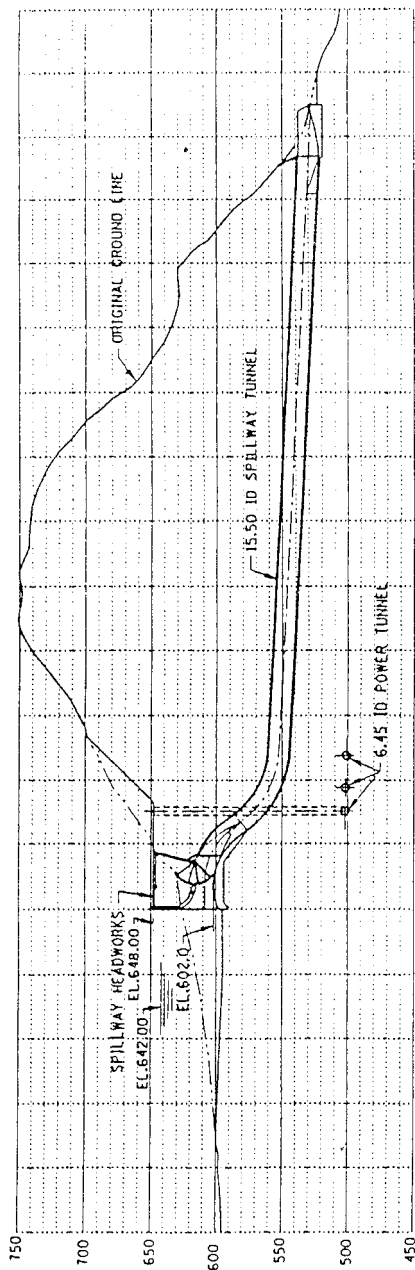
Typical arrangement of a tunnel spillway. (Harza Engineering Co., 1996).
